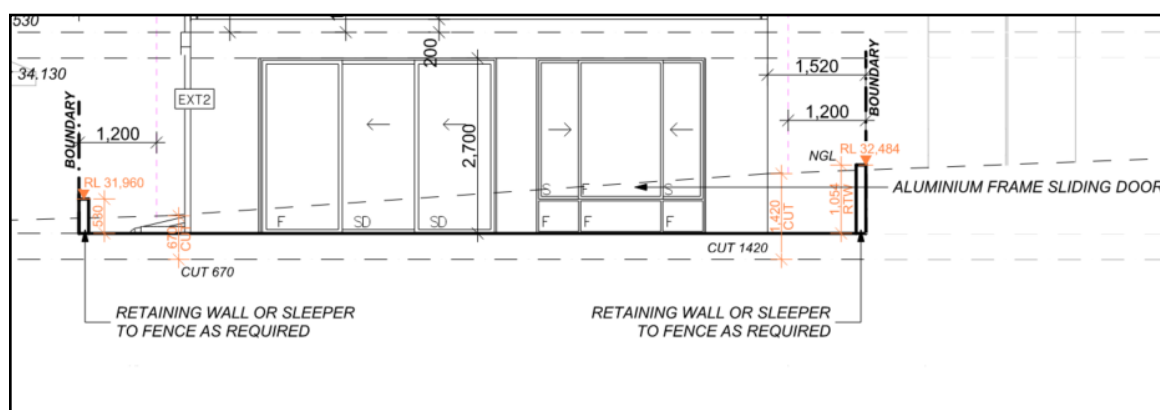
Rear of the dwelling - 54 Daunt Avenue - Demonstrating the retaining walls and cut required compared to the existing ground level (Source: Prime Design)
